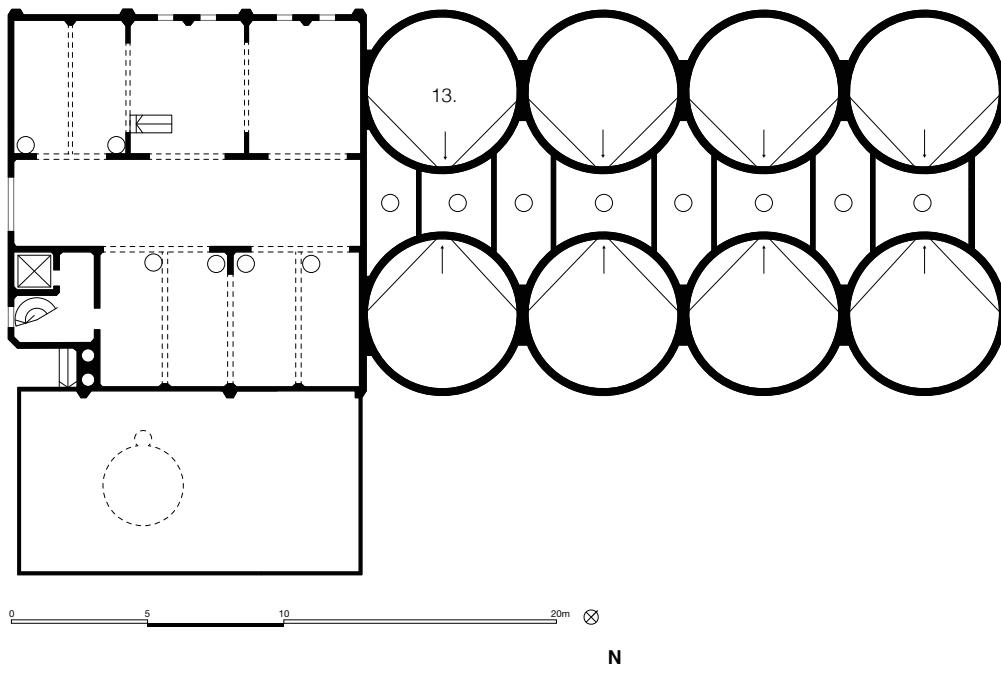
Digitilised original drawing, +13.000m floorplan, scale 1:250.
